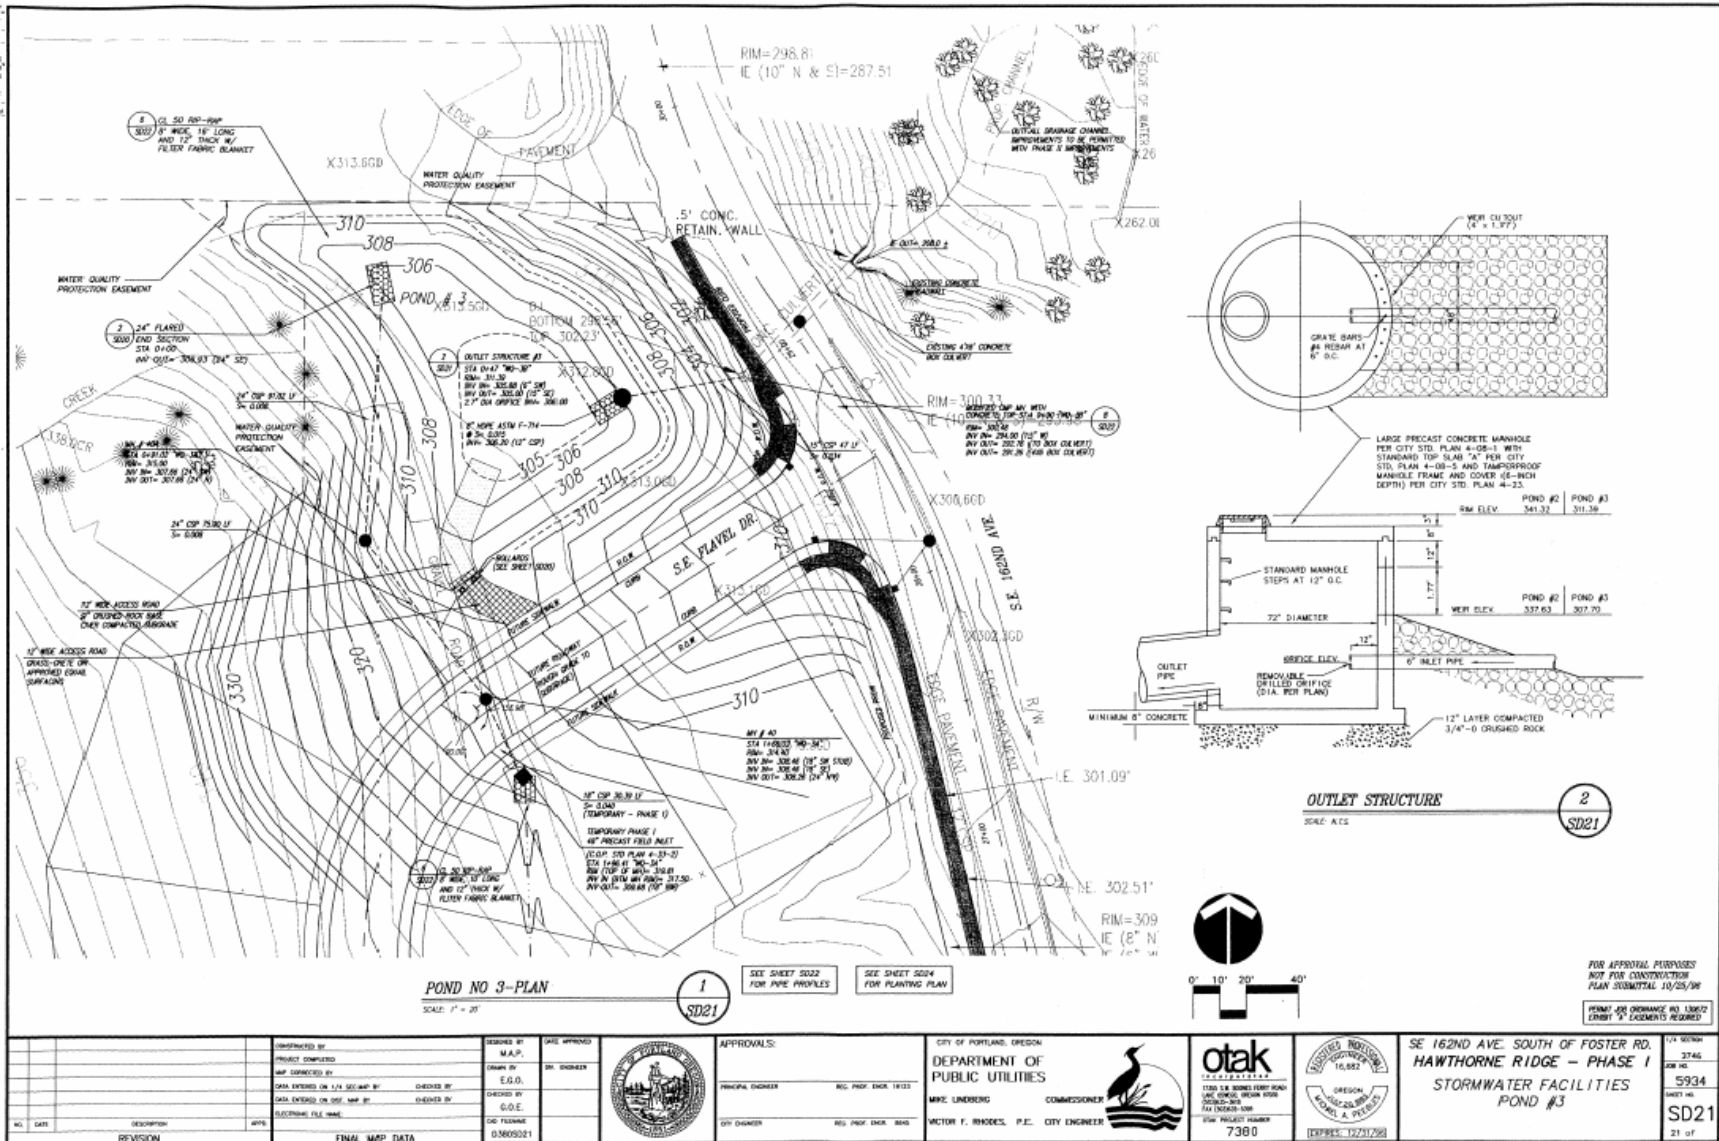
Details of Lexington Hills extended detention Pond 3 (Liptan 2001).
